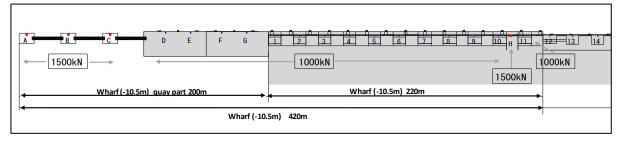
Bollards arrangement plan [Wharf (-10.5m)]
